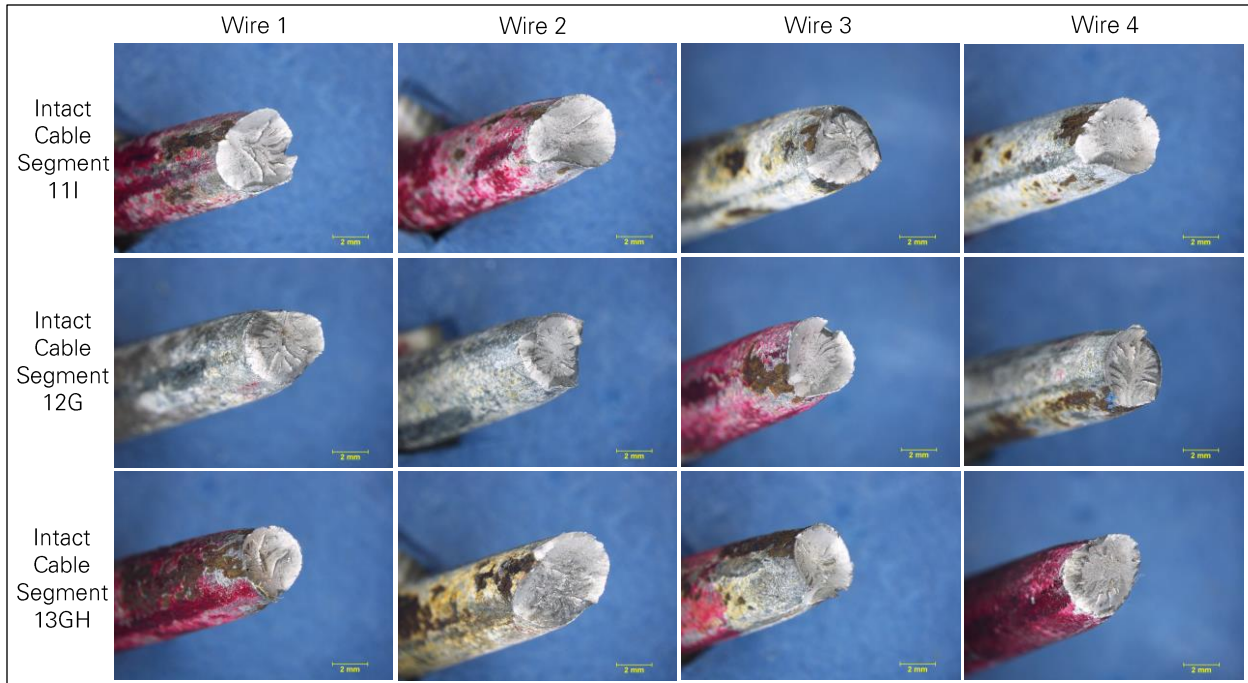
Fracture surfaces after wire tensile tests (photos: Socotec).
